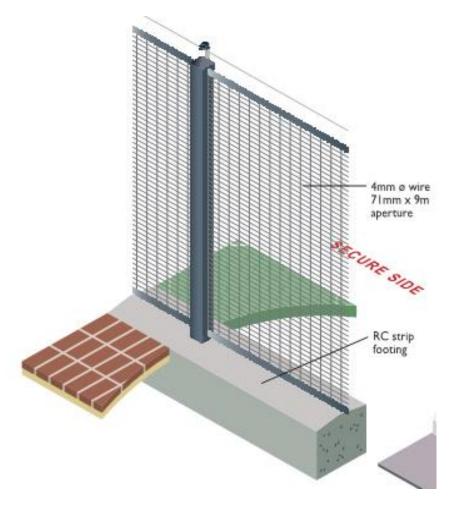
Diagram of proposed fence construction arrangement: 2.4m high vertical support posts, concrete kerb at base of fence line, angle frame support to anti-climb fence panels, with single security detection wire mounted 200mm above fence line.
